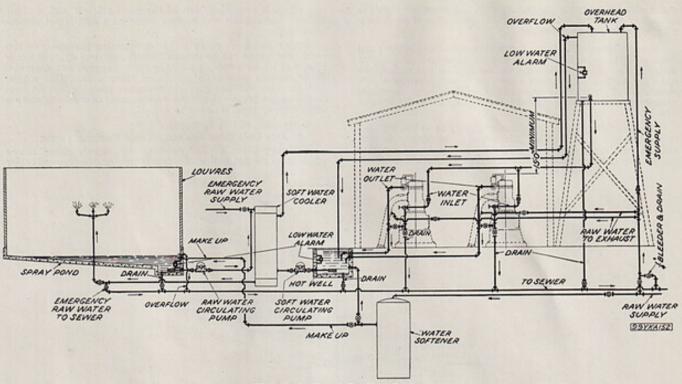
Indirect Cooling System Using Spray Pond and Commercial Tubular Cooler
